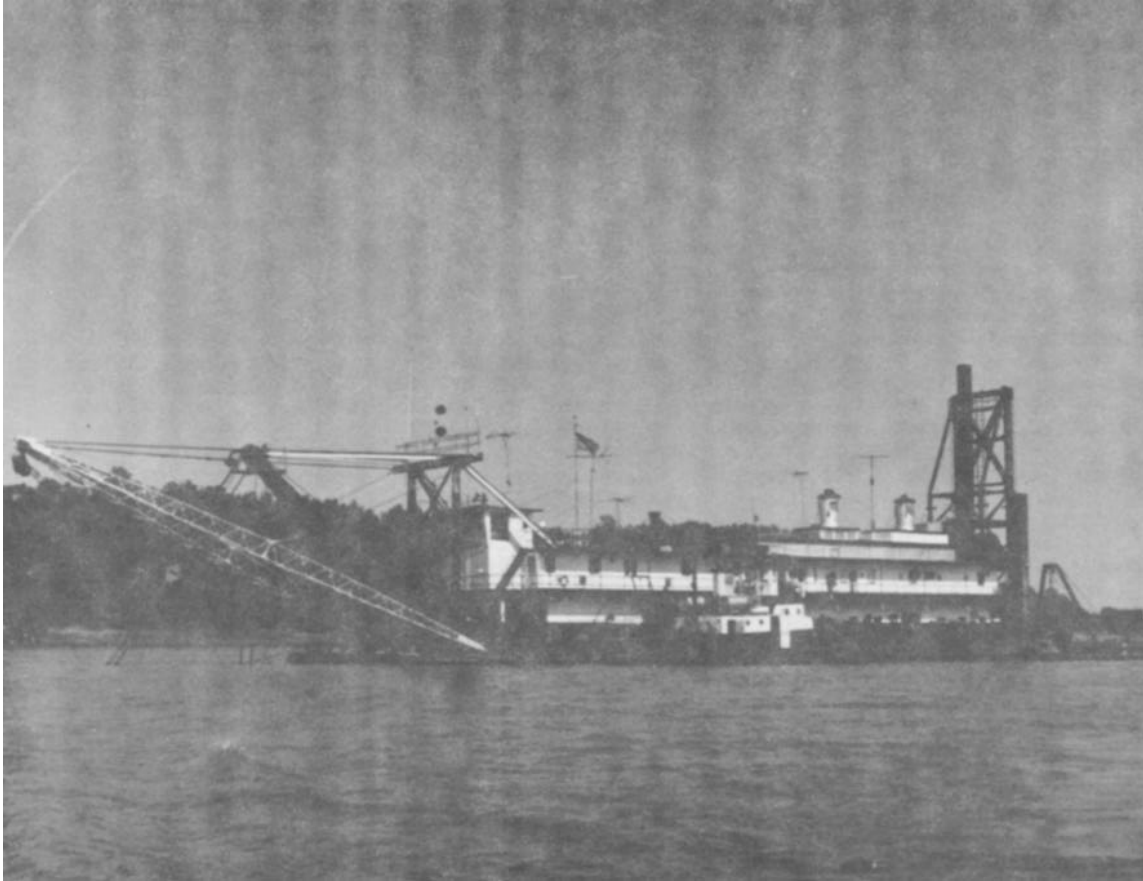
Hydraulic pipeline cutterhead dredge.
